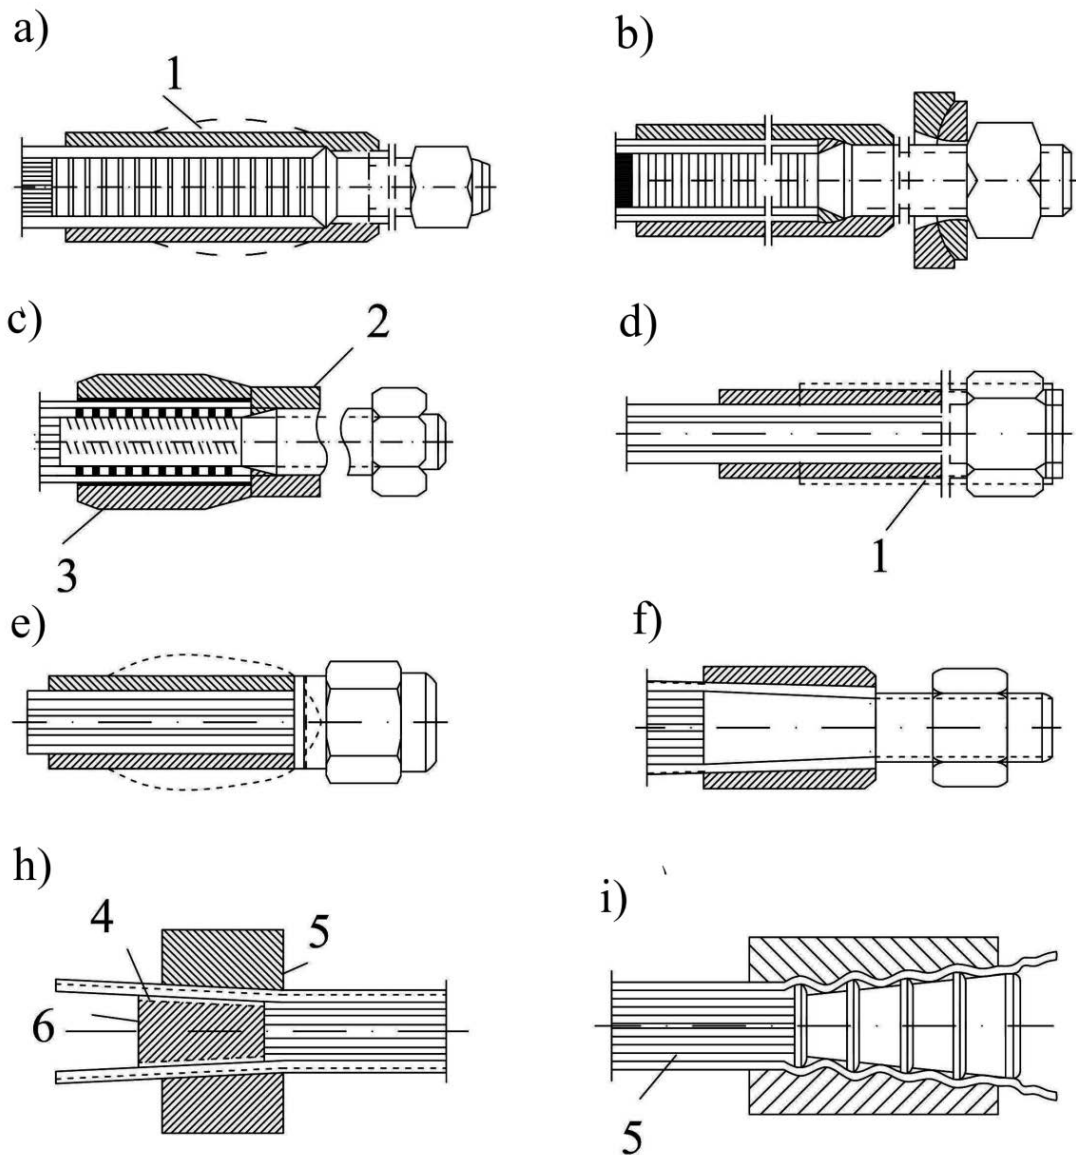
End anchor fastening for cable stays made of wire bundles: 1 – sleeve contour for compression; 2 – rod; 3 – spiral; 4 – thread; 5 – block; 6 – plug
